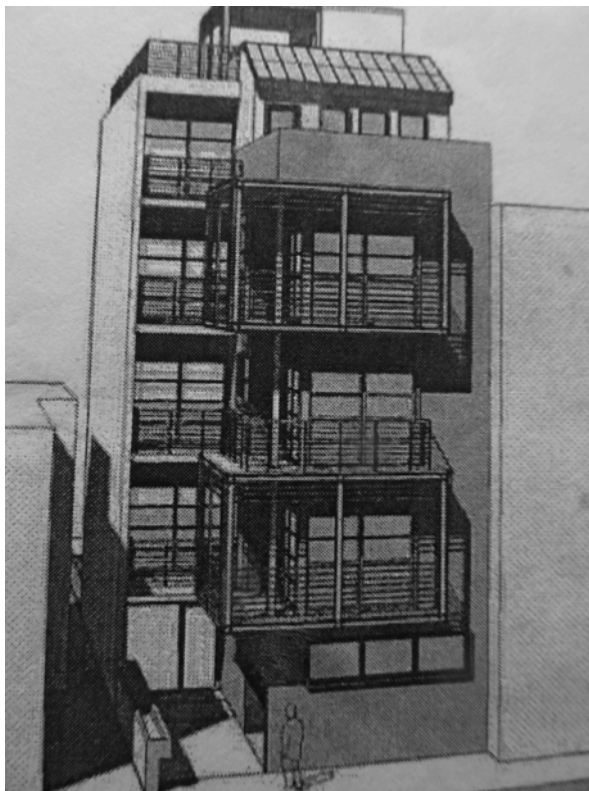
Roof top gardens and solar installation. Location: Battery Park City, Manhattan (Source: The Green Building Handbook (2010). New York City Economic Development Corporation)
